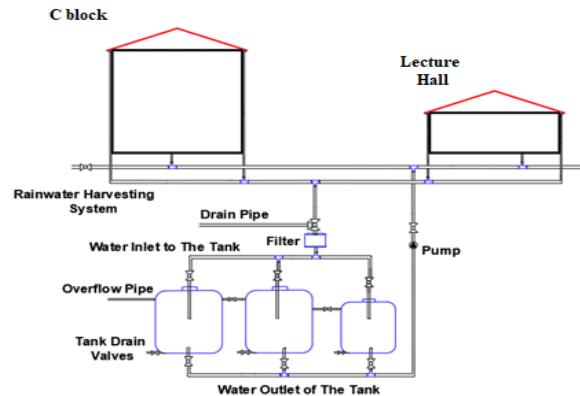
Rainwater harvesting system design for block C and Lecture hall buildings.
